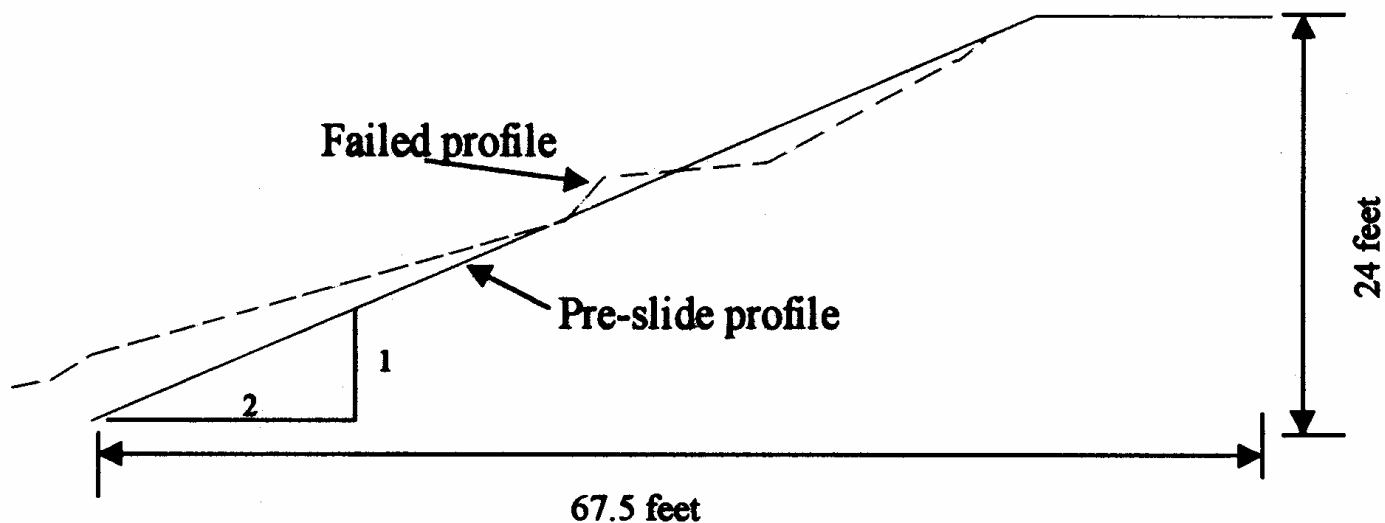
Typical cross section of U.S. Highway 34 slide, Monroe County, Iowa.
